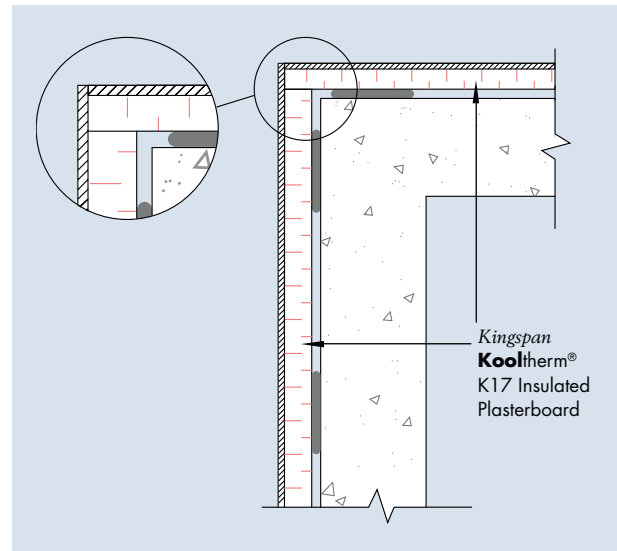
Insulated reveal and external corner with Kingspan Kooltherm® K17 Insulated Plasterboard
